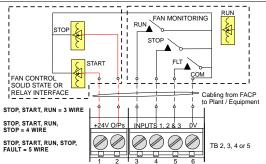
Fan Termination Board Layout and Typical I/O Wiring
